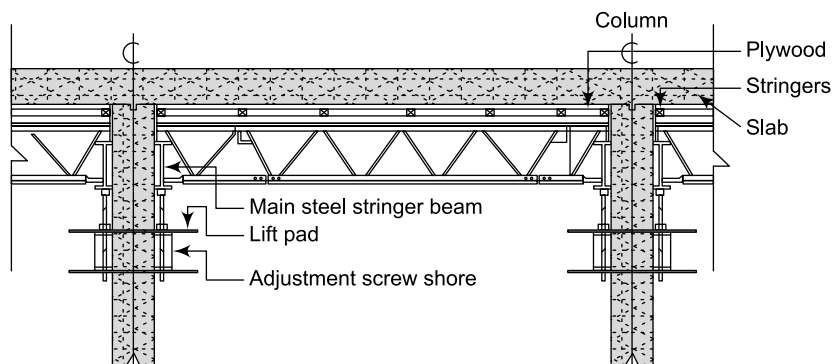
Schematic Sketches for Column Mounted Shoring System.
